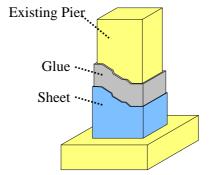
Construction Steps of Steel Plate Jacketing
